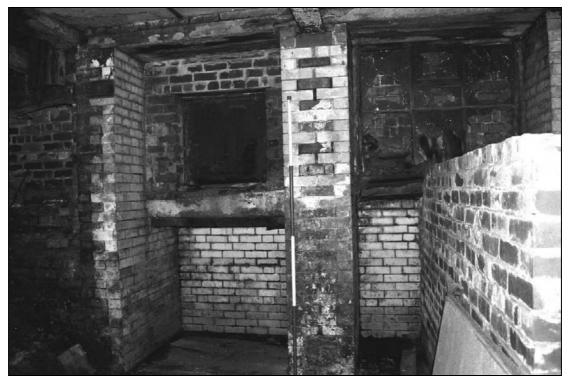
Detail of glazed brickwork and coal chute and blocked lightwell, B3 west range (film 3.35)
